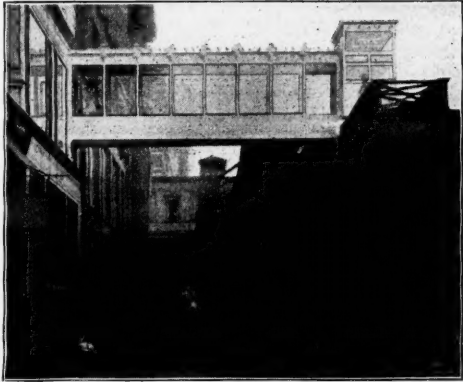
Bridge to Dry Goods Store from Elevated Railroad, Chicago.
